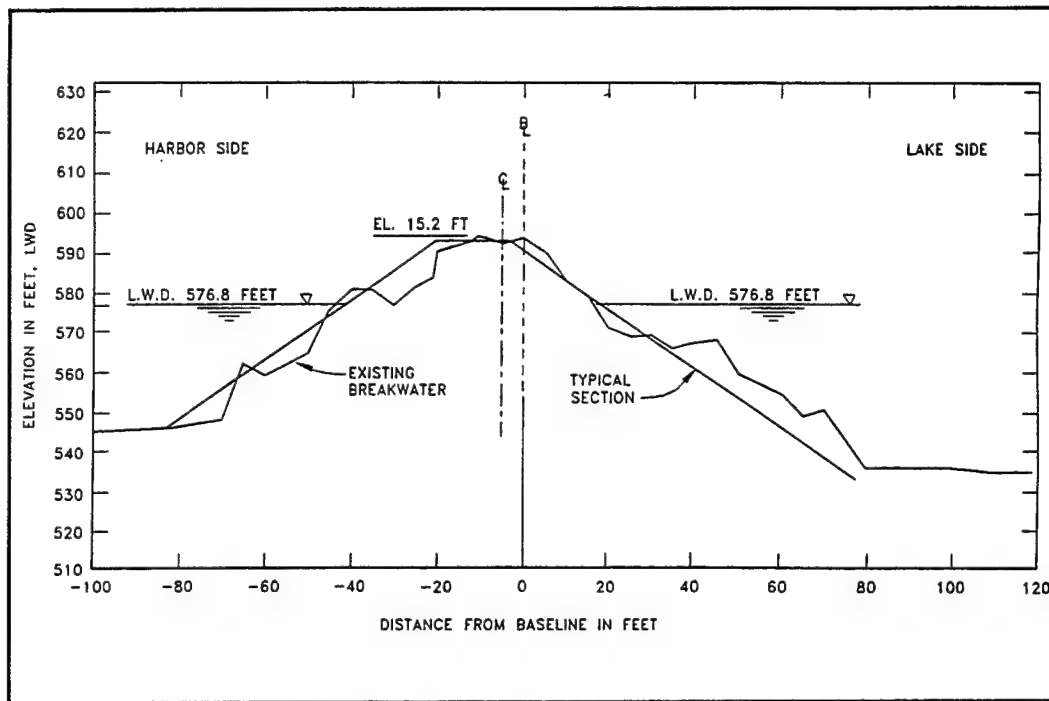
1985 Survey cross section, Station 26 + 00
